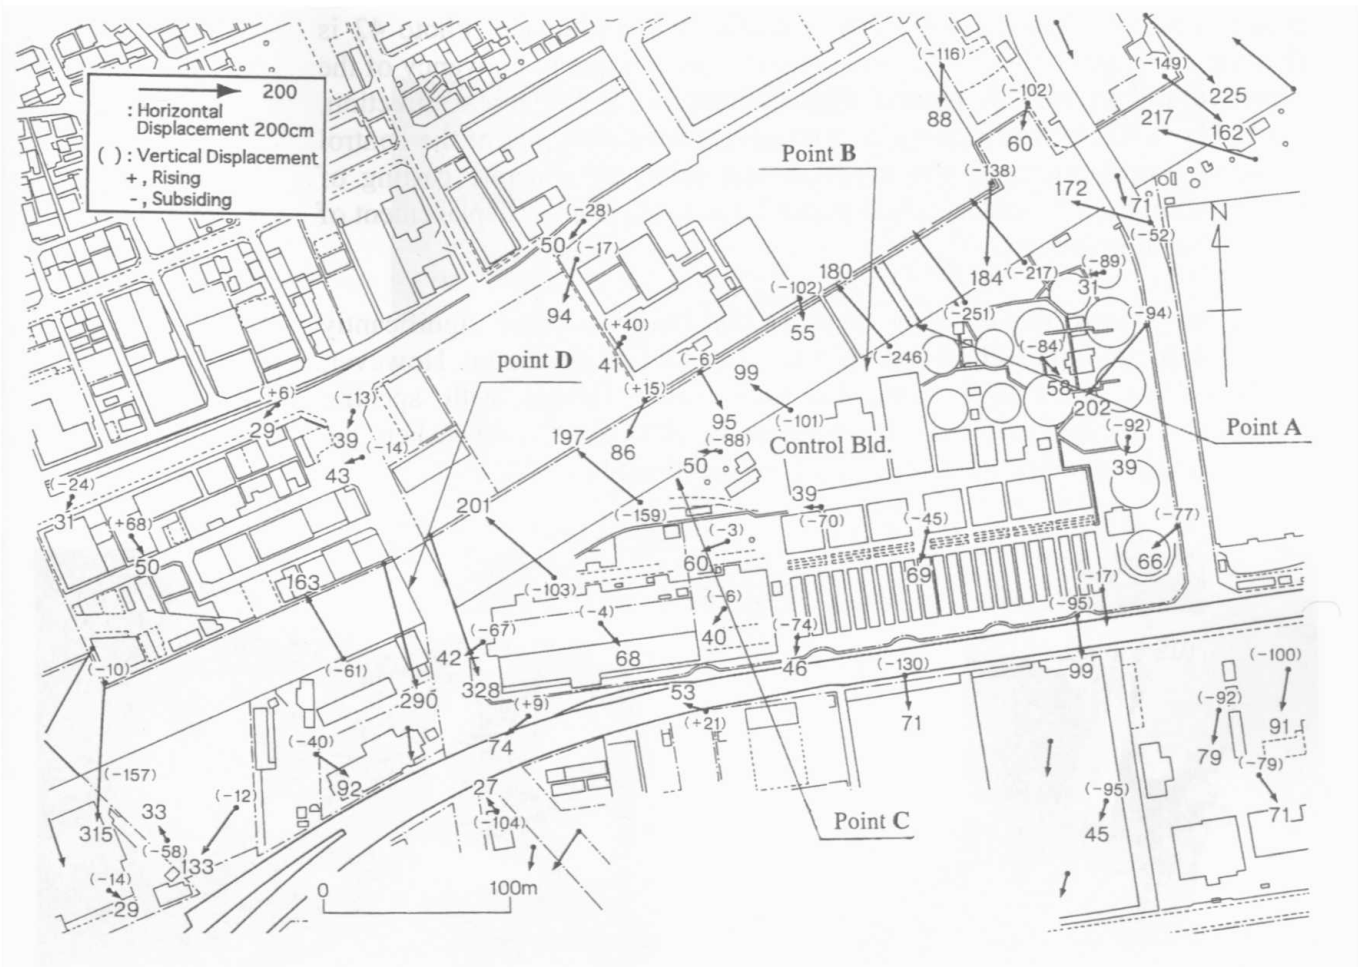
Plan of Higashinada Sewage Treatment Plant and ground displacements¹⁾
